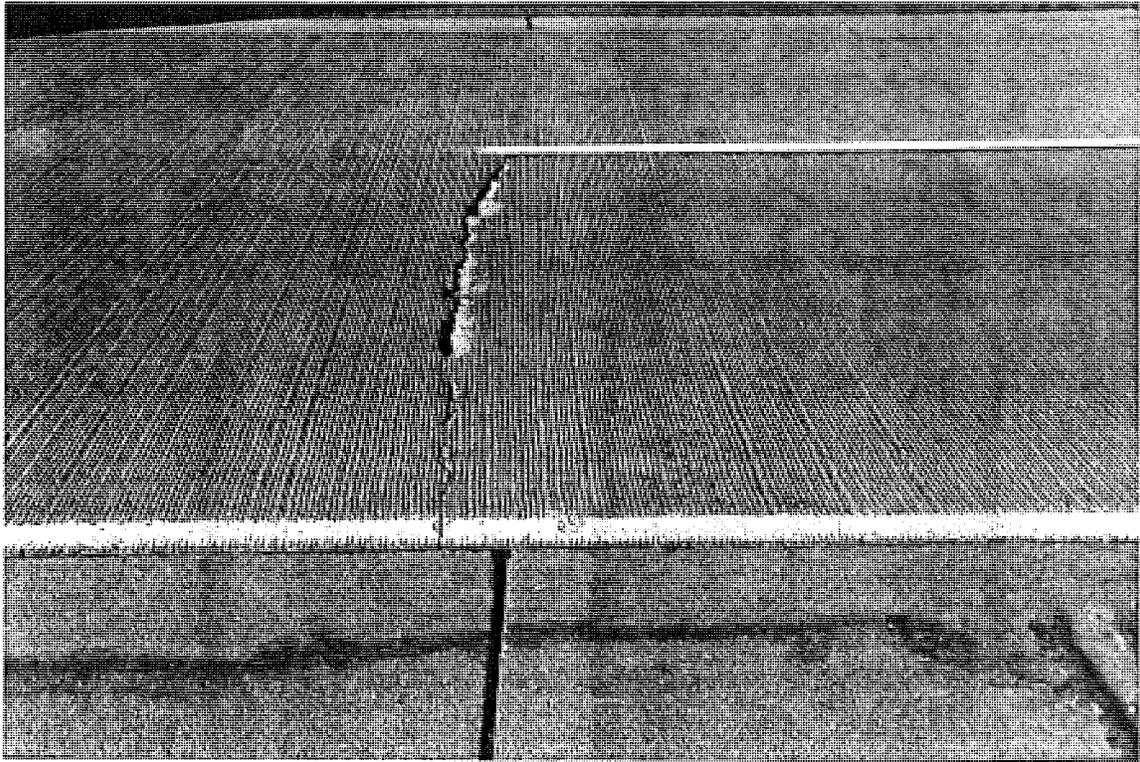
A full width transverse crack on CSN# 44044-18804A WB. The crack is tight in the passing lane and is spalling in the truck lane. This crack, was induced by the intermediate shoulder joint.
